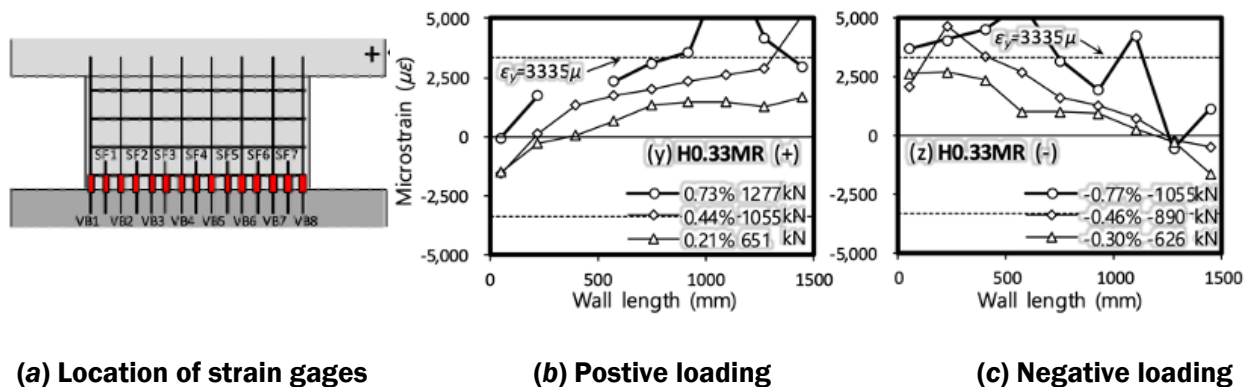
Measured longitudinal reinforcement strains at wall-foundation interface of a shear-friction-controlled wall test (Beak et al., 2017).
